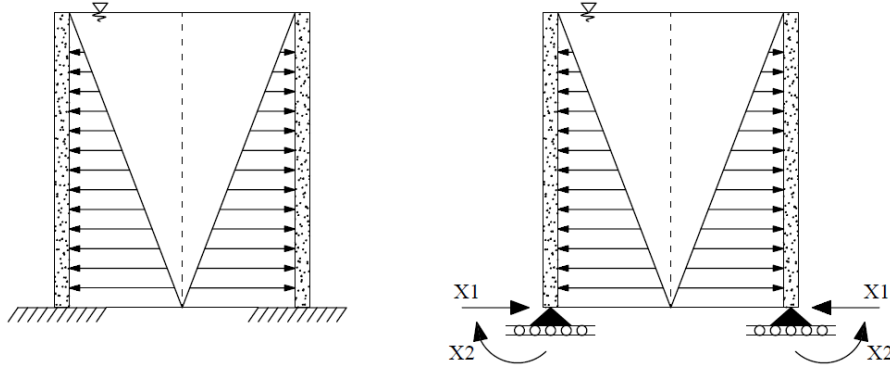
Fixed supported cylindrical wall and equivalent isostatic system of the wall.
